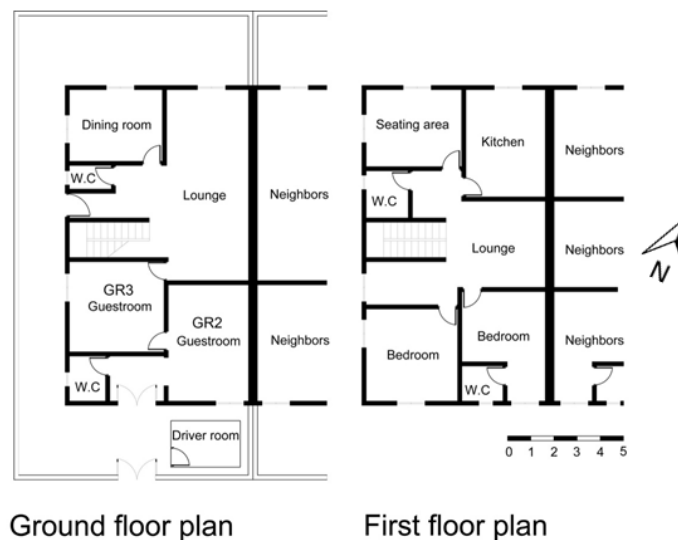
Architectural drawings of the case study building in Riyadh.
